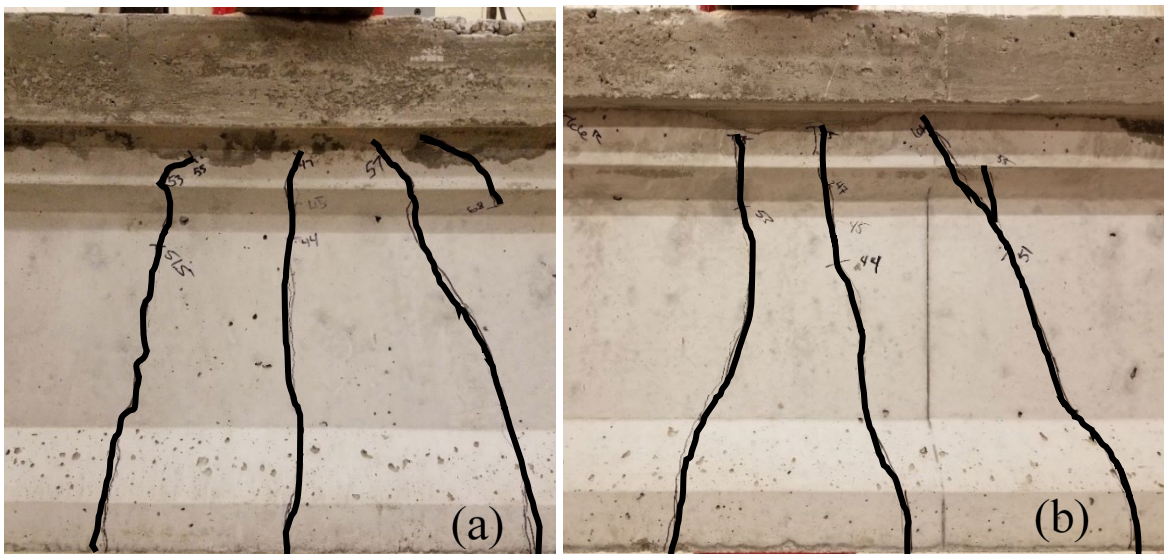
Final flexural cracking under the load point in the RC2-N (a) and RC2-S (b) girders are indicated by dark lines
